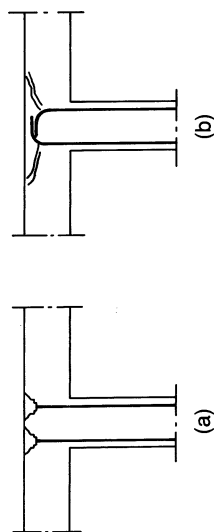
Possible damage caused by compression bars ending near concrete surface
